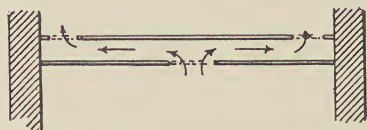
Section through Floor of Corridor, showing Passage of Heated Air.
